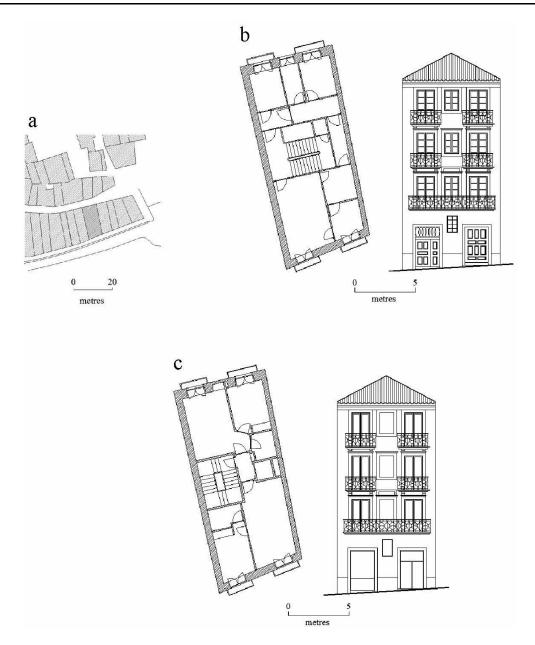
Transformation of internal structure and façade. (a) Location plan. (b) Floor plan and northern façade before transformation. (c) Floor plan and northern façade after transformation.
